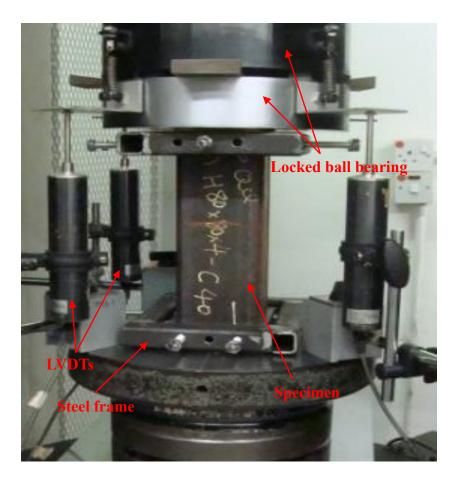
Test setup of concrete-filled stub column Specimen 80×80×4-C40-A
